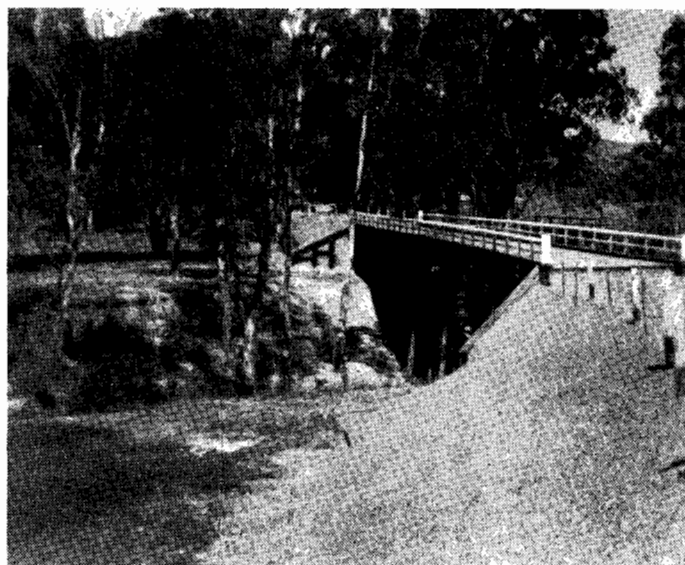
Yea Shire—Upper Goulburn Road.—Bridge over King Parrot Creek (approaches not completed).
